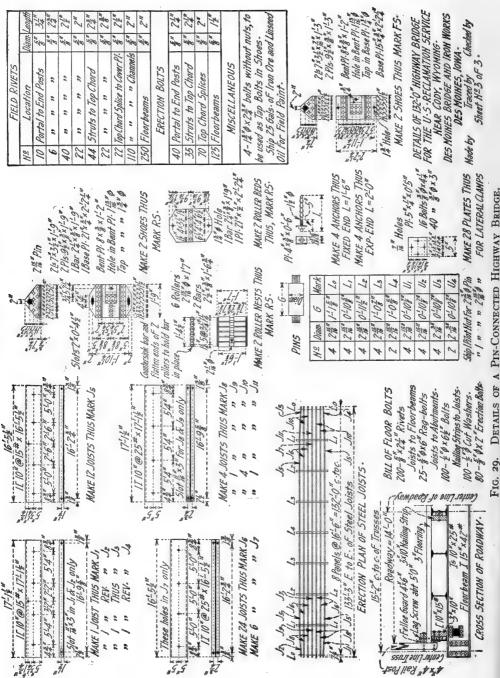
DETAILS OF A PIN-CONNECTED HIGHWAY BRIDGE.
